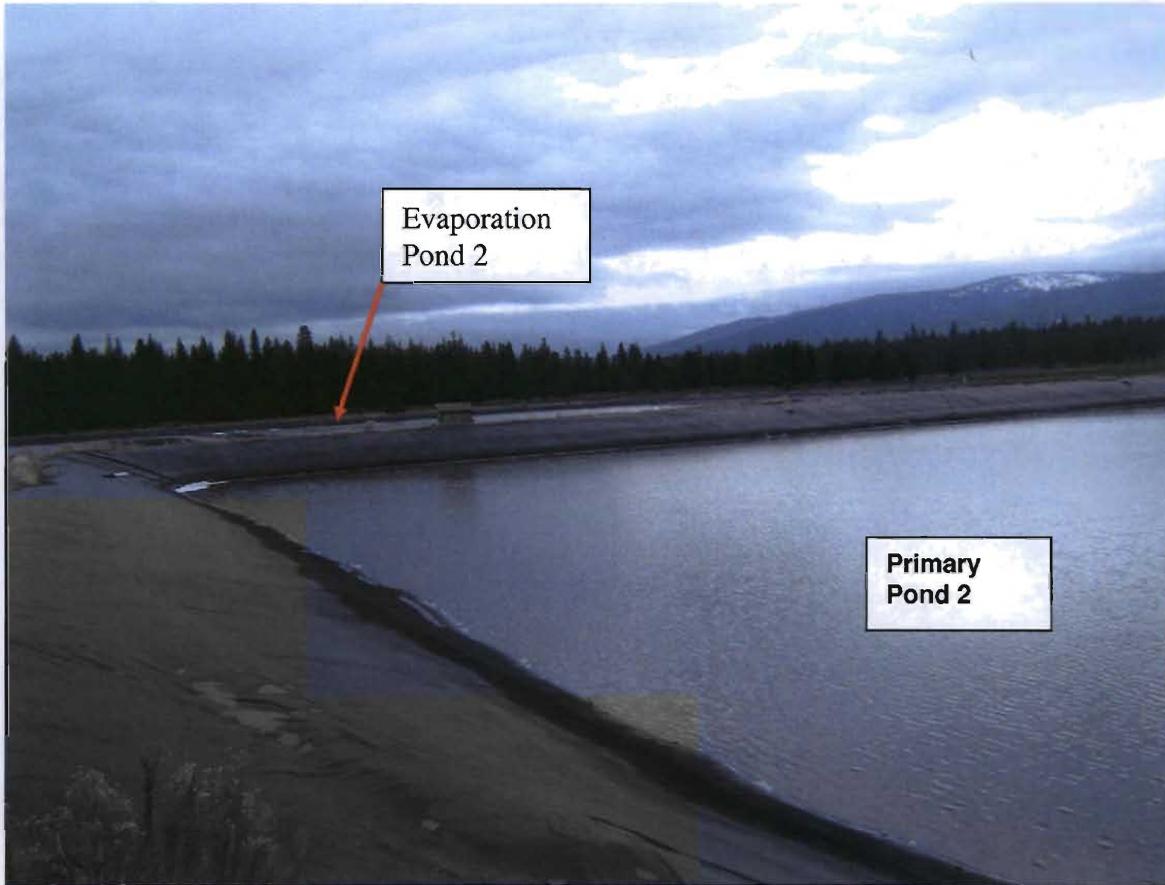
Eagle Lake Wastewater Facility – Looking south west across Primary Pond 2. Evaporation Pond 2 visible. (Taylor Zentner, 05-01-09, Sony Cybershot camera)
